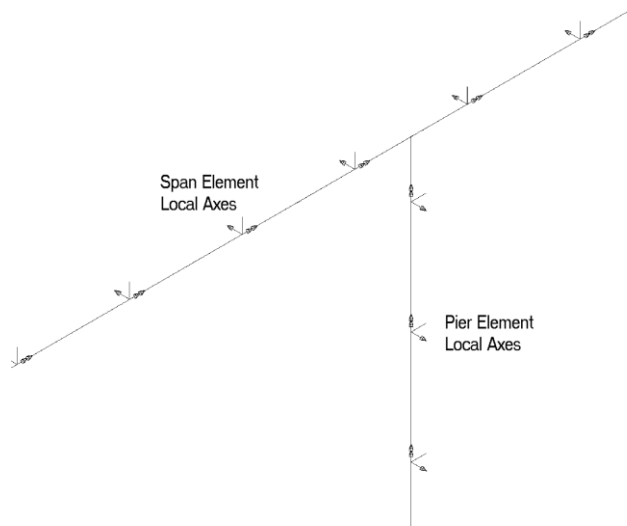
Beam Element Local Axes for Deck and Pier Modelling
